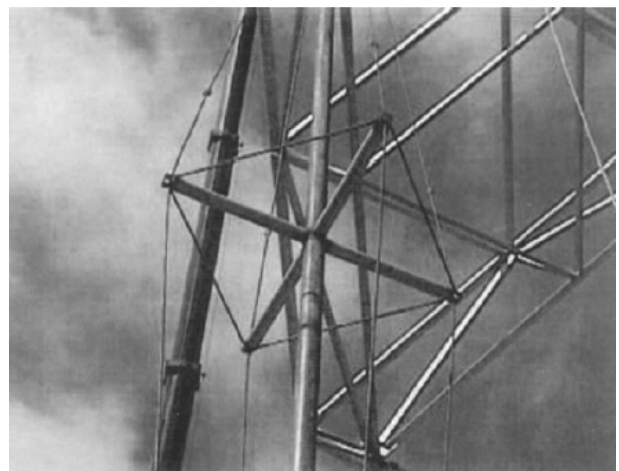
Example for Assembled Column System (Andrade et al. 2003)
